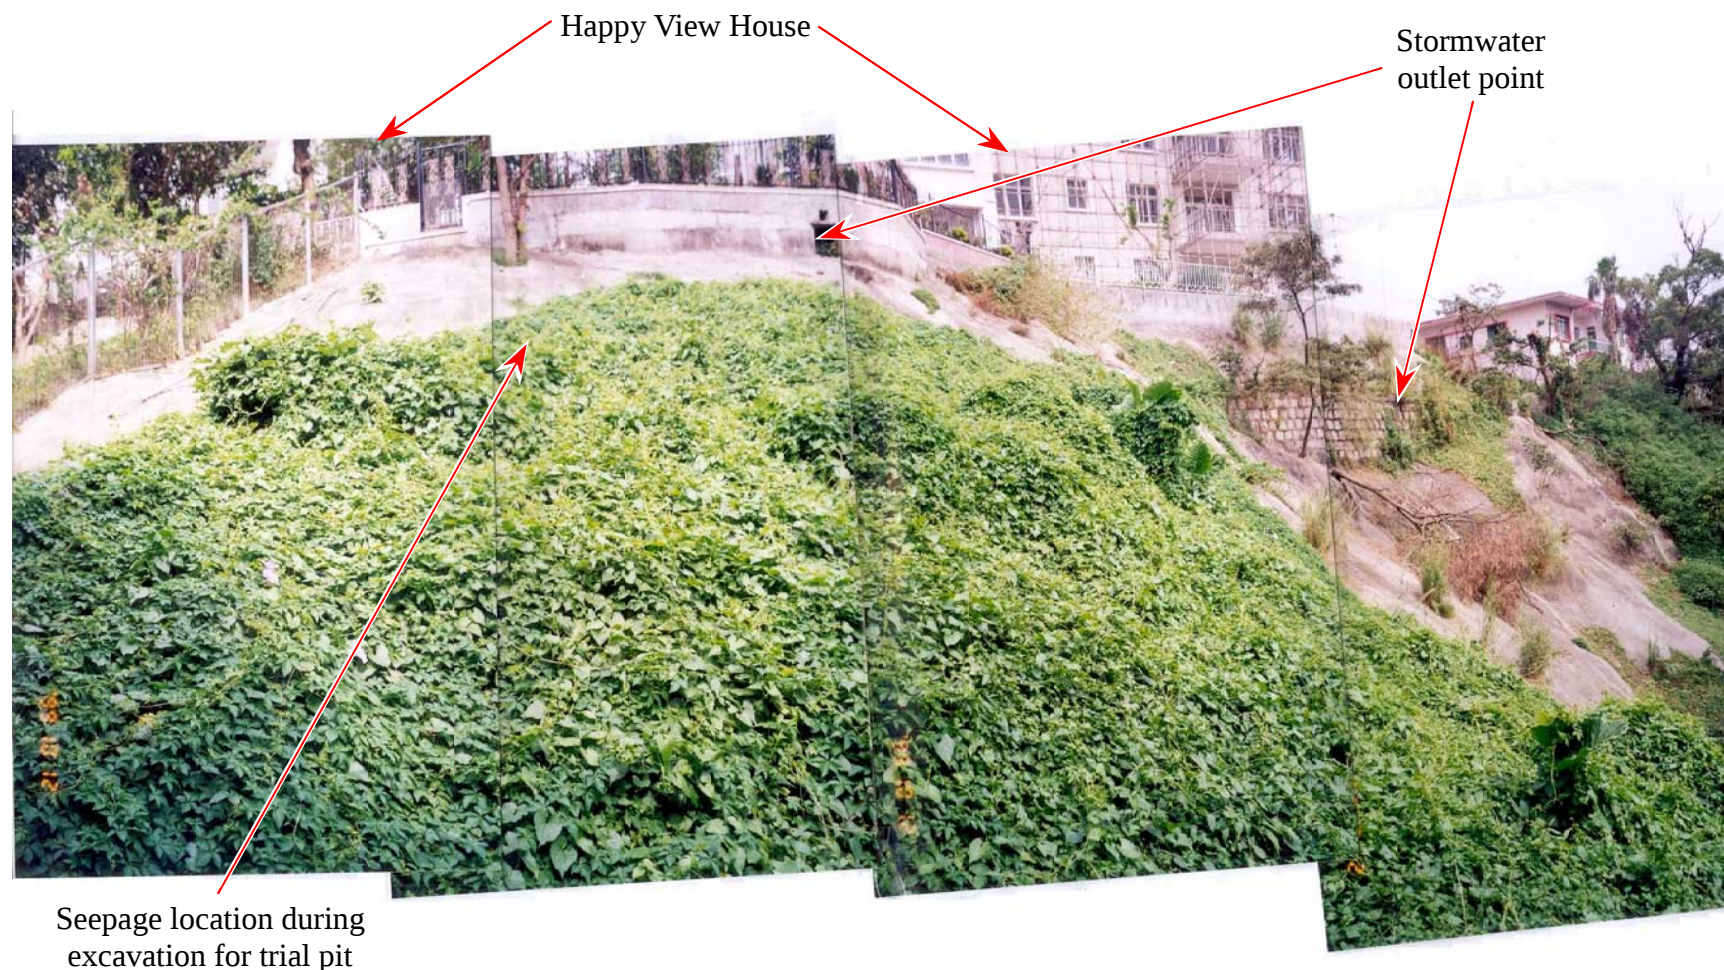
Stormwater Outlet from Happy View House (Photograph Taken on 12 October 1999)
